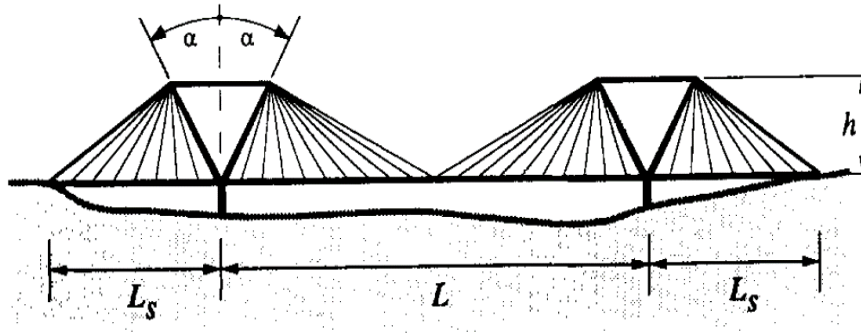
Layout of the spread-pylon cable-stayed bridge proposed in Starossek (1996).
